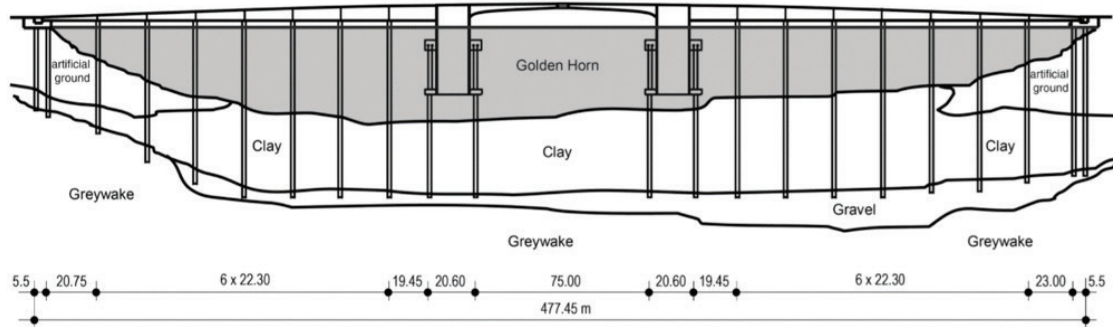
Side view of Galata Bridge designed with steel piles (Ozden Caglayan, 2015)
